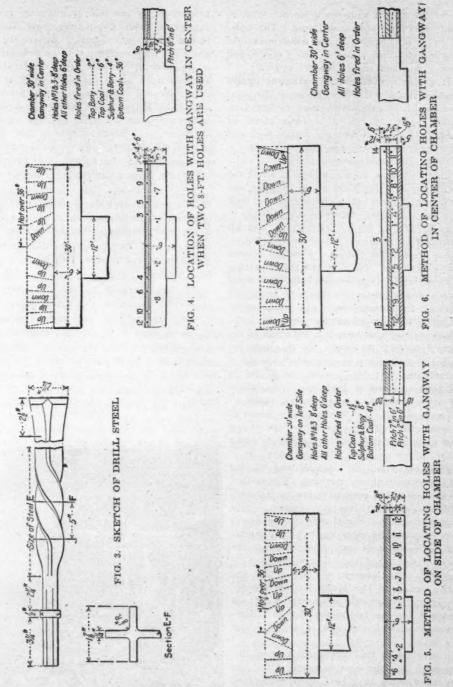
also is a 30-ft. chamber. In this case the top coal is 1½ in. thick, a band of sulphur and bony 8 in. thick and bottom coal 31 in. thick. Twelve holes are required,
